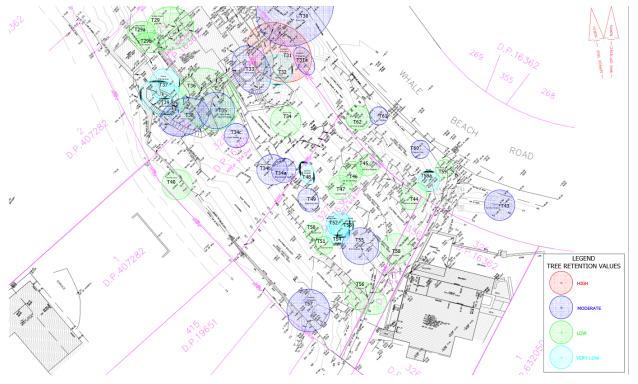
Extract of tree location plan (2) (Source: Earthscape Horticultural Services)
